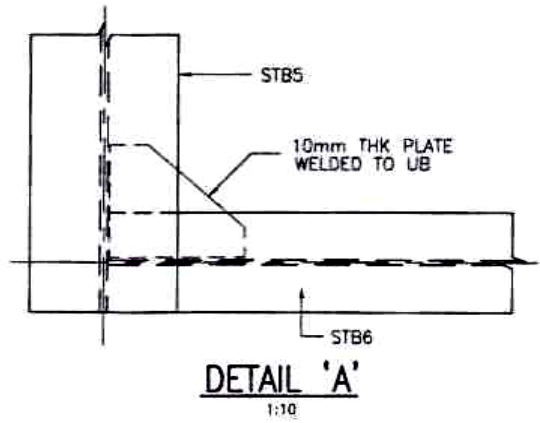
Details for cantilever joint (details and sizes shown are indicative only)
